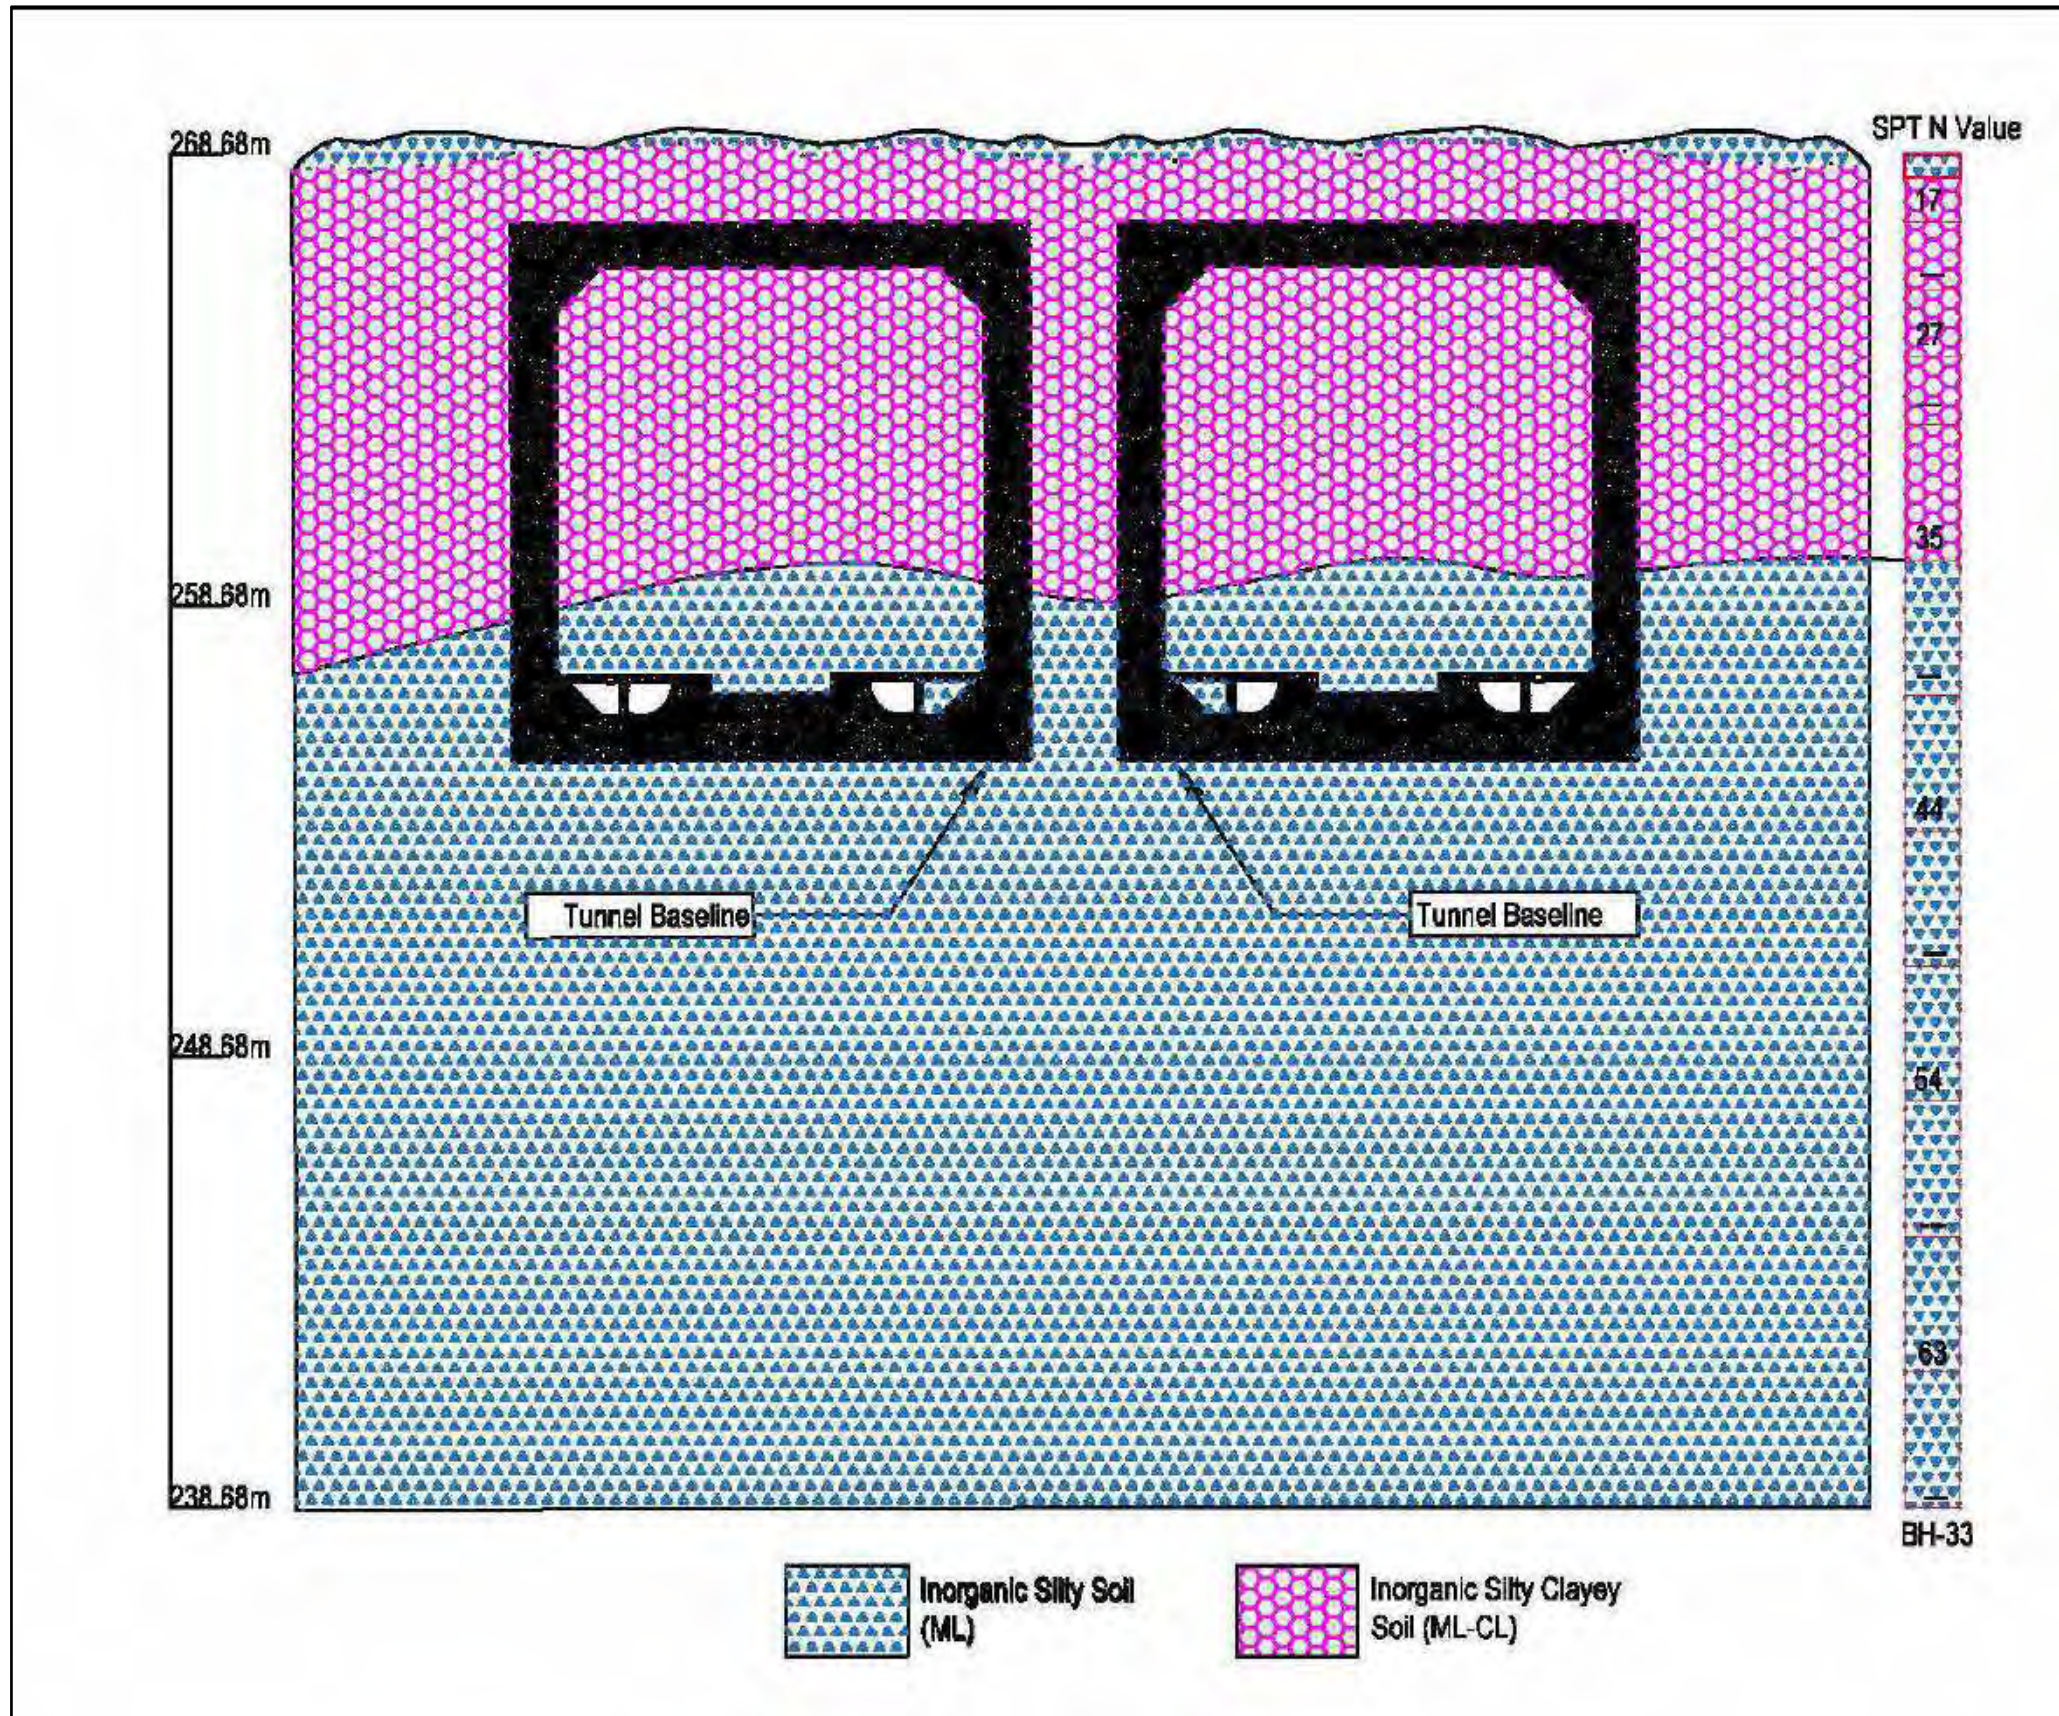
Cut and Cover structure at the end of tunnel – Portal II (CH29600).
